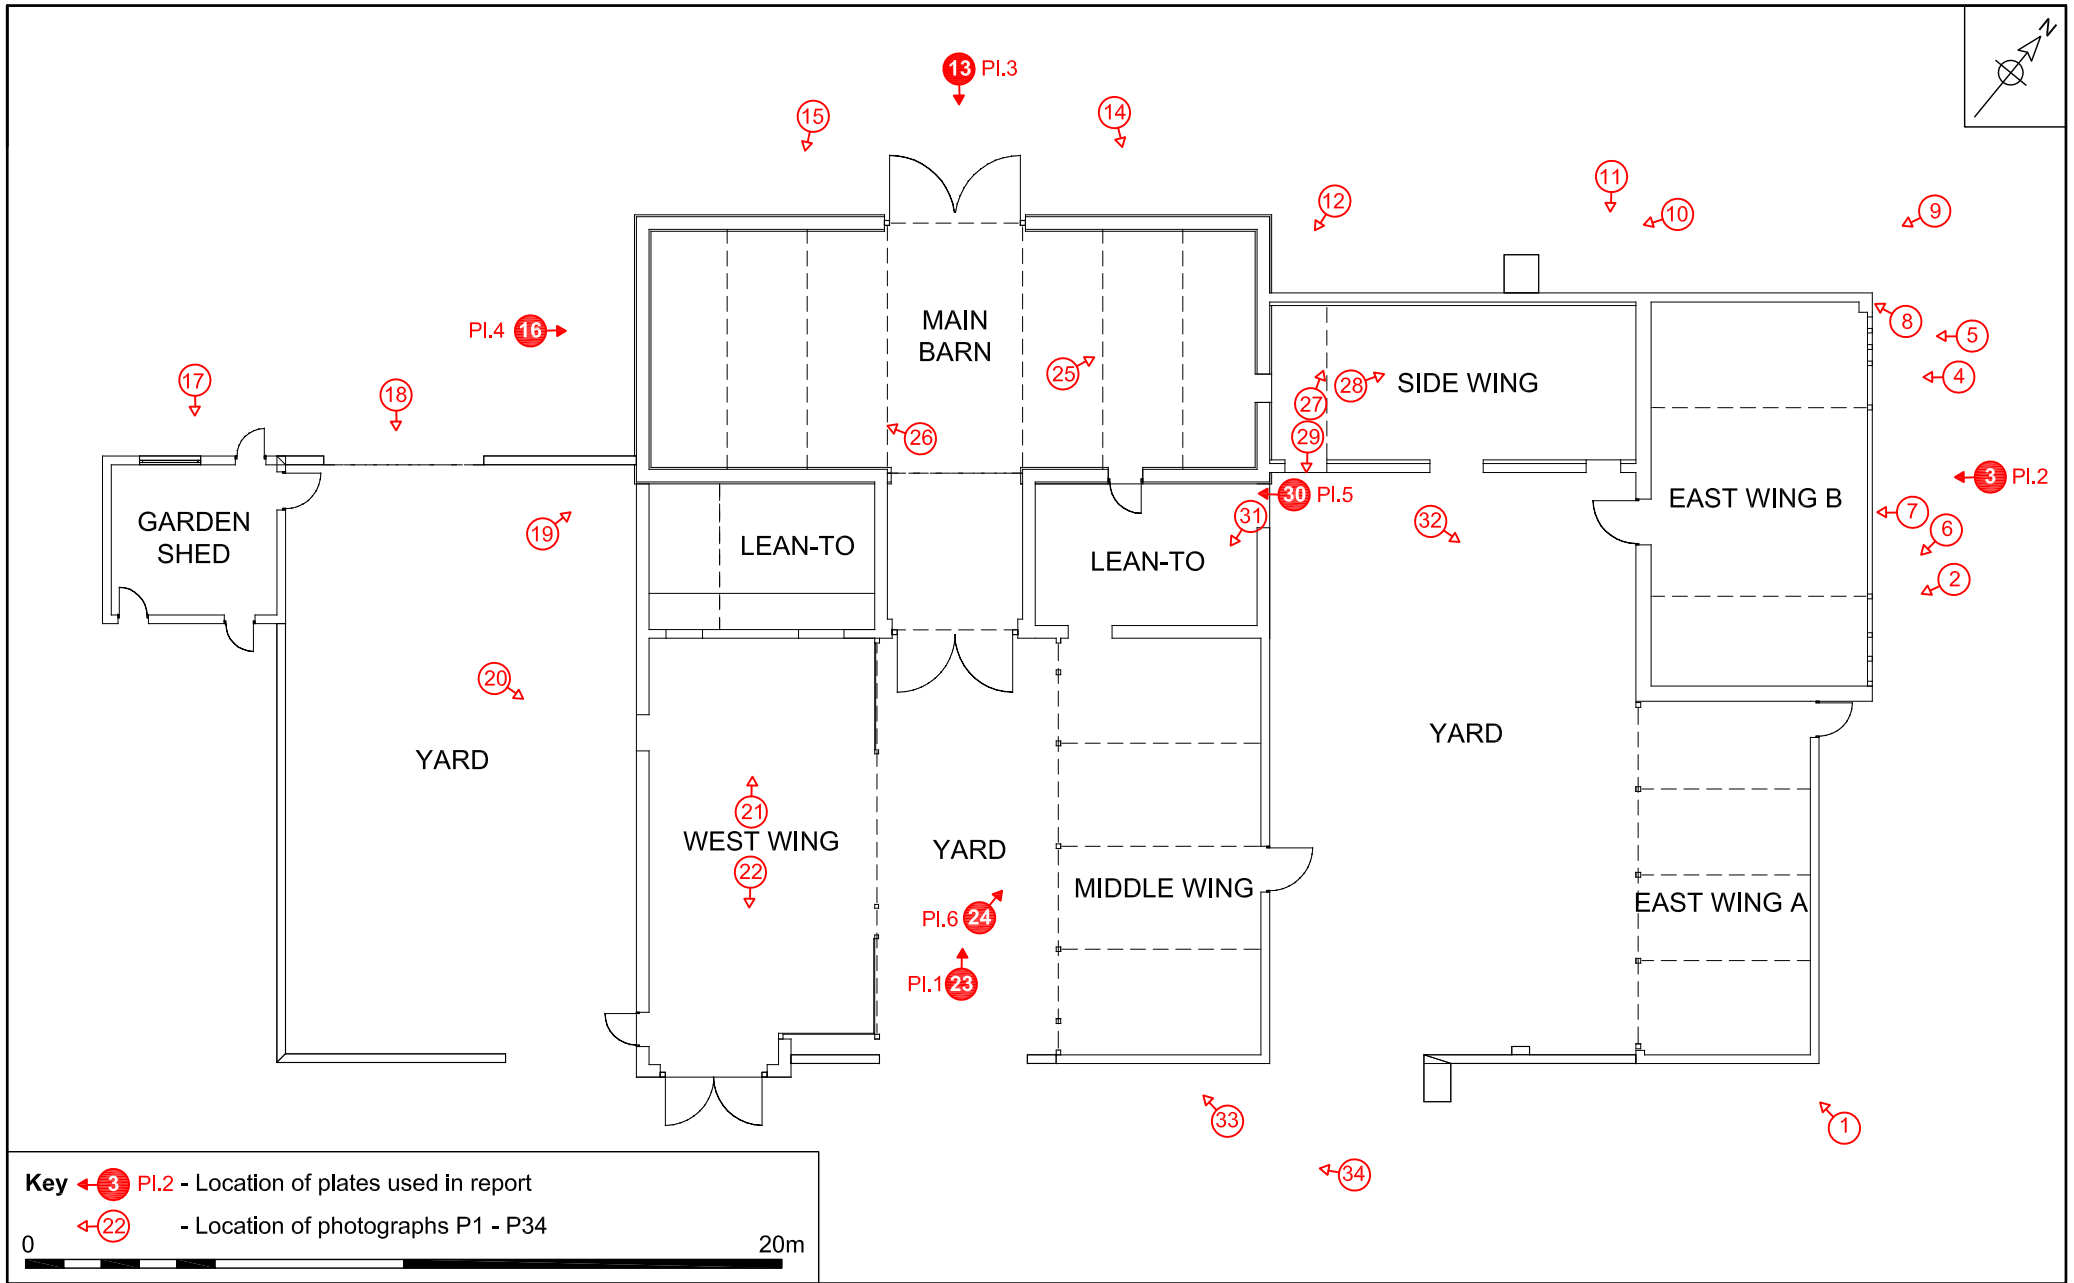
Plan of existing barn buildings (courtesy of Elmbid Ltd.) and location of photographic survey (available in the archive). Scale 1:200
